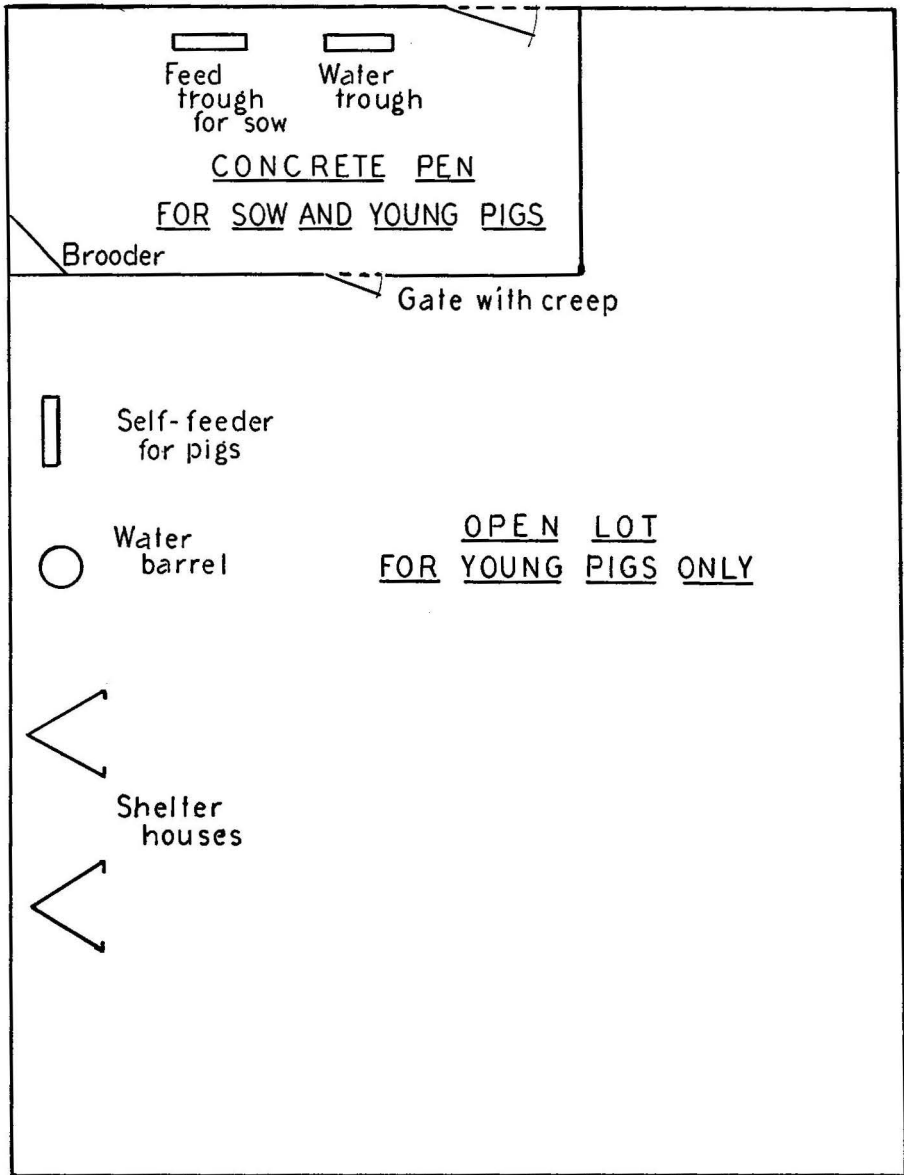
Plan for raising sow and young pigs on concrete floor, giving the young pigs access to a lot free of kidney worms.
